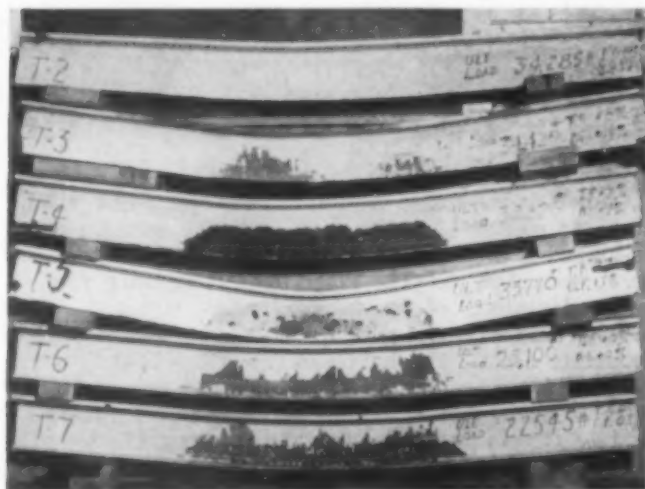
TESTS ON SEVEN T-BEAMS with and without prestretching show increased strength in beams subjected to prestretching of T-section or of both T-section and plate. Details of test procedure are given in Table I, below.
